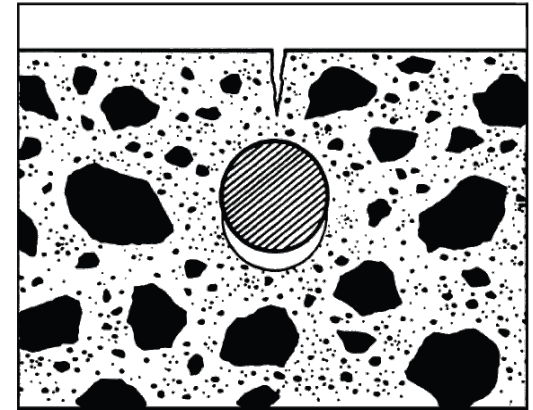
Crack formed due to obstructed settlement (Price 1982).
